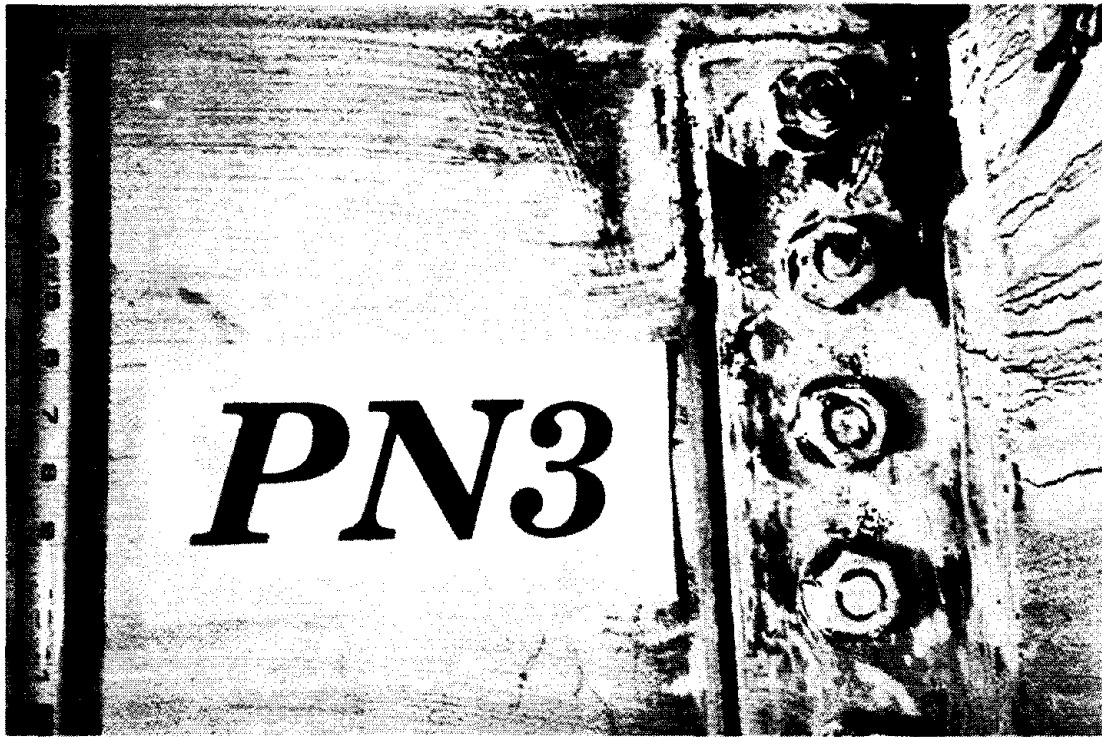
Tearing of Weld Return and Yielding at Top of Shear Tab
